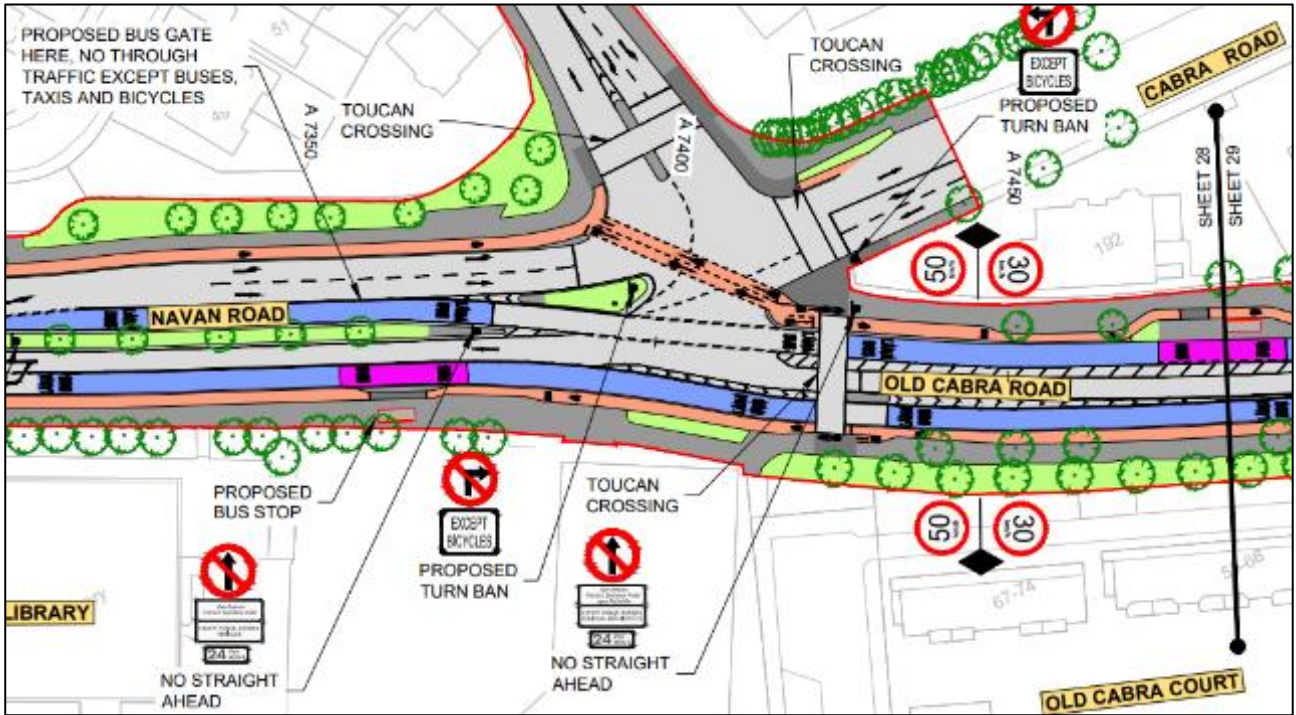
Navan Road / Old Cabra Road Junction
